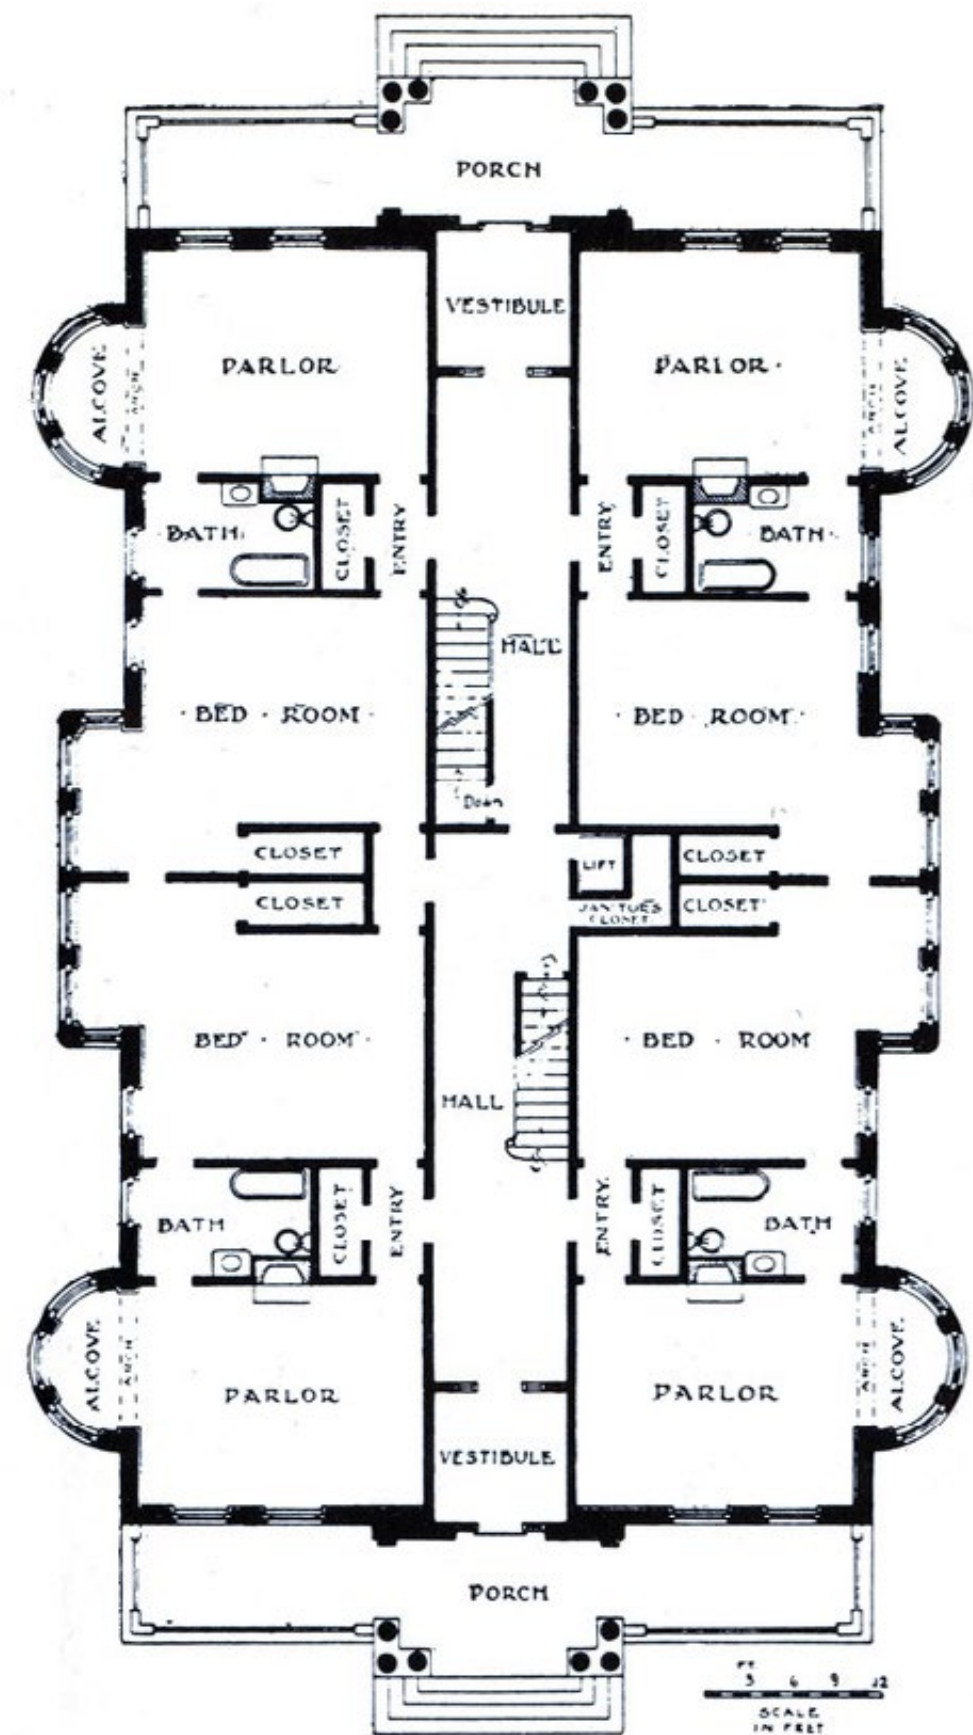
Plan of a kitchenless apartment house In New York. (Peck, 1990)
